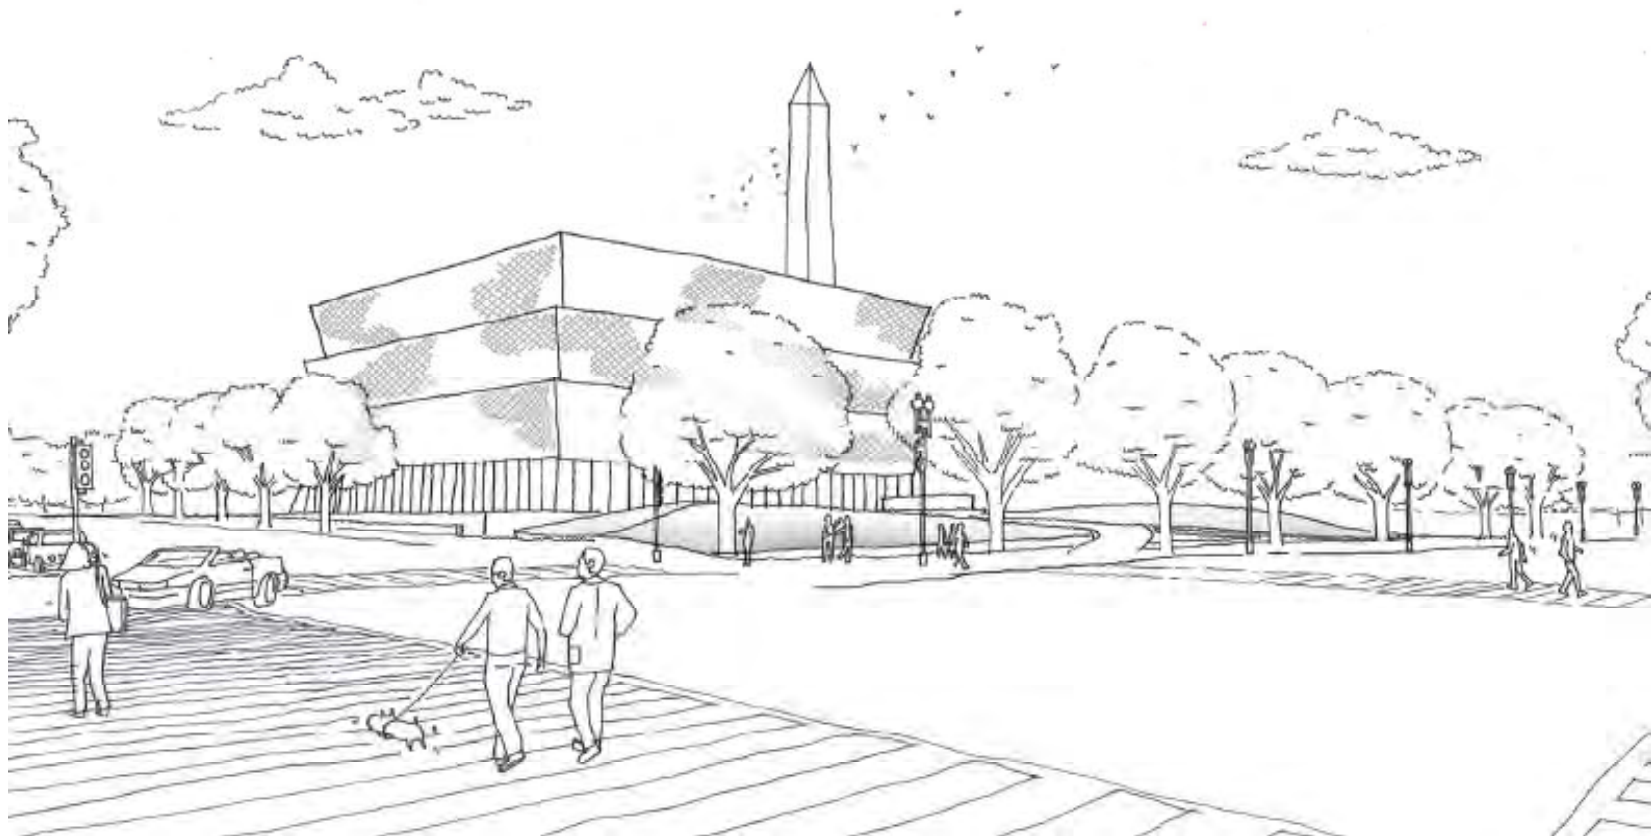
shows a sketch of the north (Constitution Avenue side) portion of the Refined Pavilion Alternative. Figure 2.3.17 shows the building cross-sections. Figure 2.3.18 shows the ground floor plan. Figure 2.3.19 shows the plan view of the primary building components.
